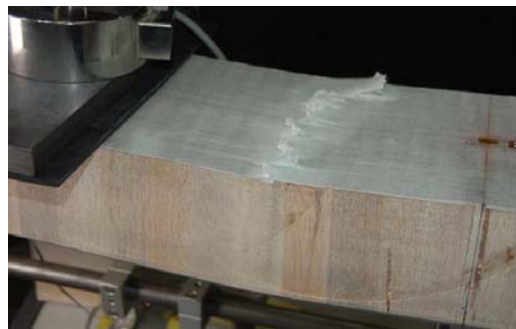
Typical failure of B-H and B-L beams (beam B-H-3 is shown)
